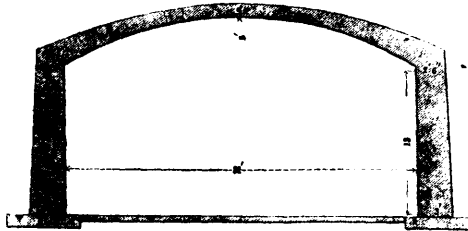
Section of Beton Tomb, Span 31 Feet.
